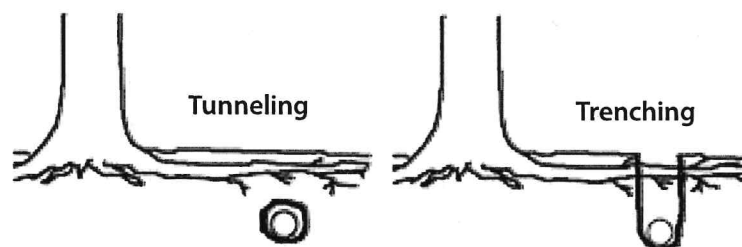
Utility lines may be placed near trees without root injury by tunneling underground. An alternative is trenching with a pneumatic air excavator or careful hand digging.
